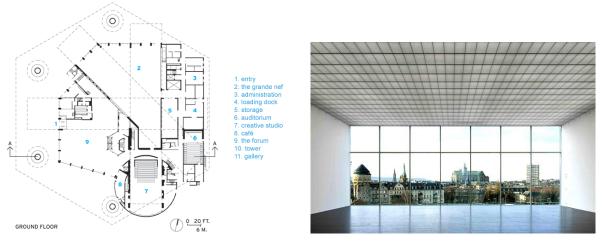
(a) Ground Floor Plan of Centre Pompidou-Metz; (b) A View from the Inside of Metz Pompidou
